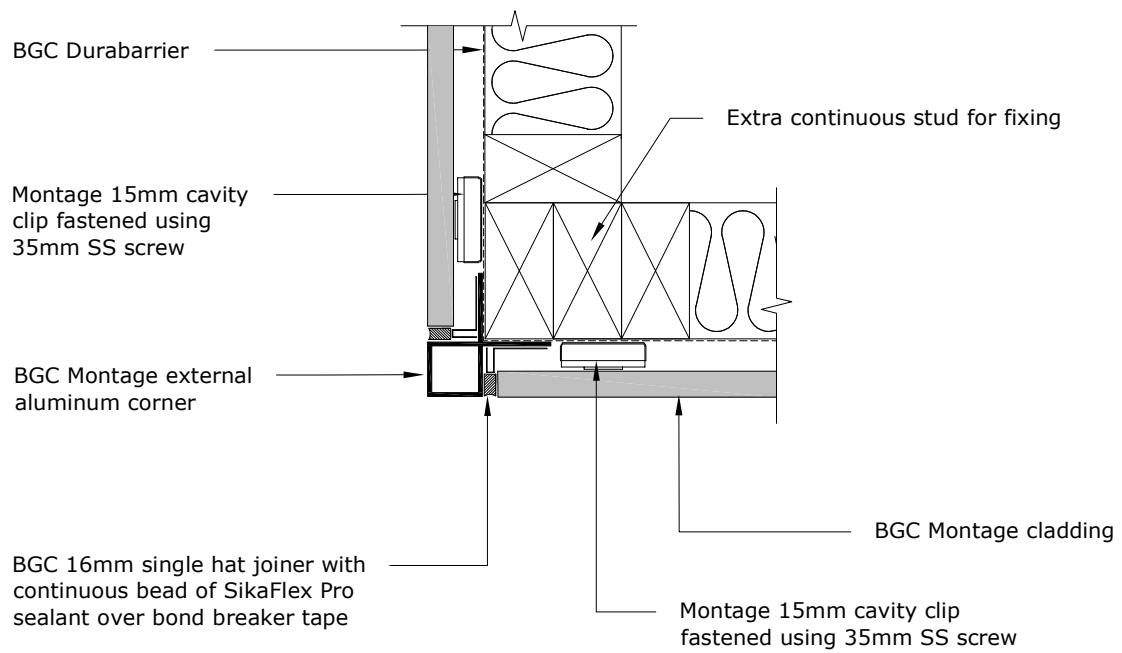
DETAIL External Corner Detail - Preformed Corner Horizontal Installation
